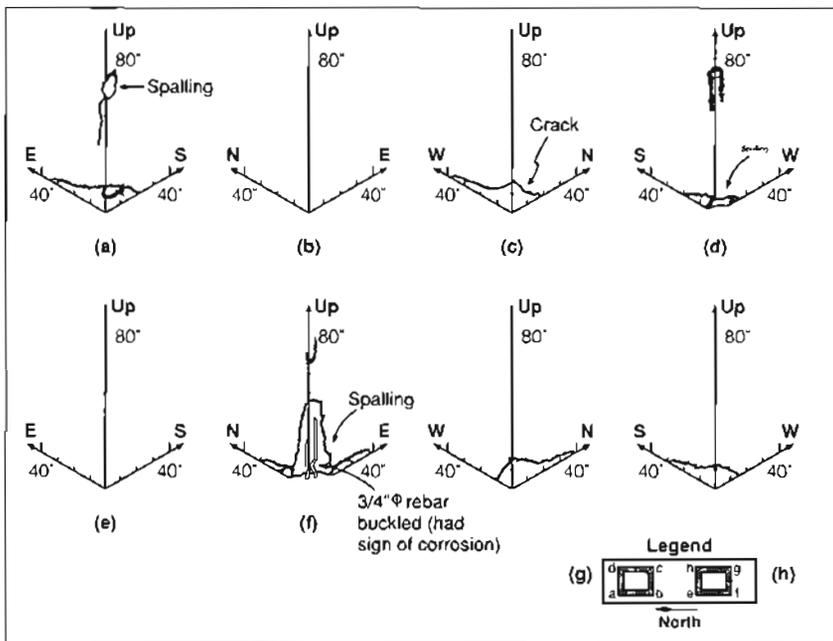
Cracking patterns at the corners of the bases of pedestals at Pier E17.
